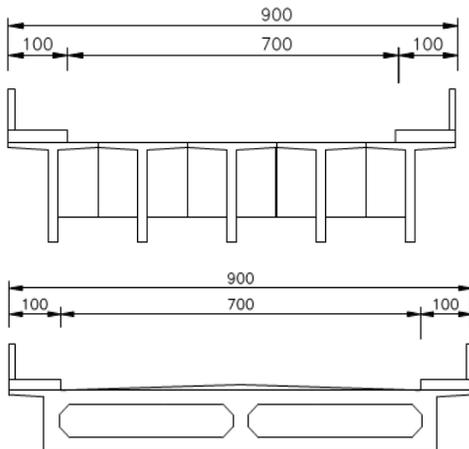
Bridge superstructure (simply supported T beam) and prestressed continuous box girder (Unit cm)
